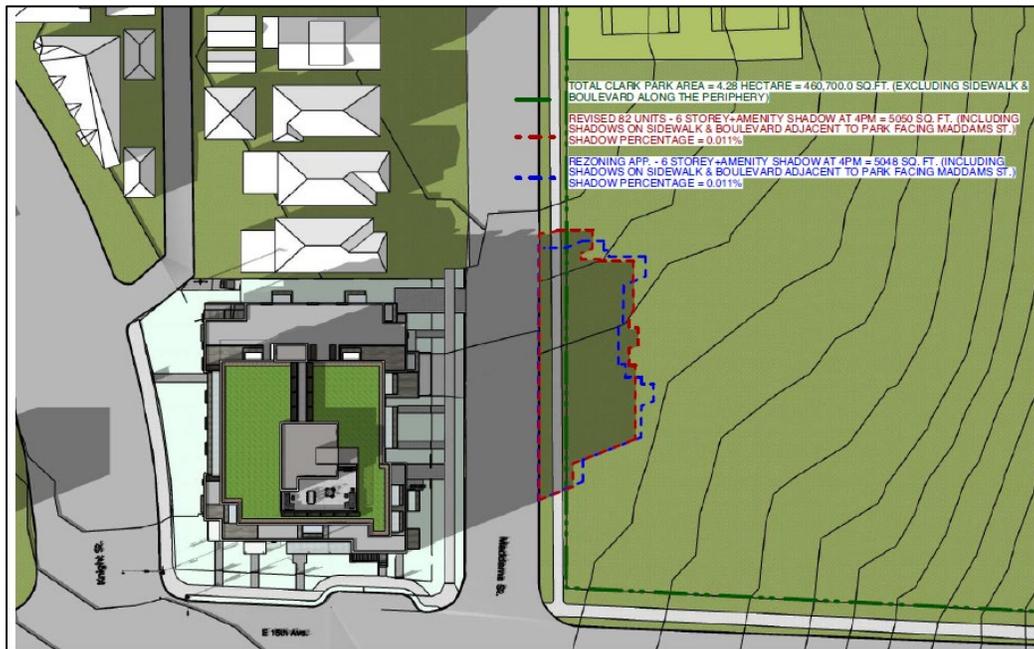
Building Shadows at 4:00 pm – March/September 21st
